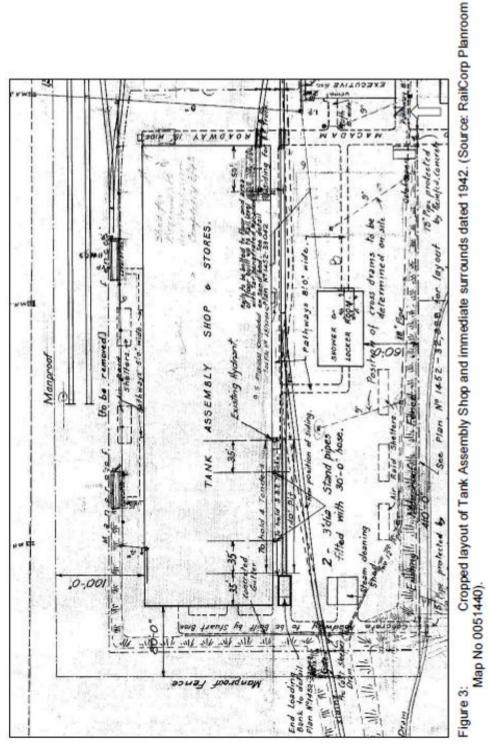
Plan from 1942, useful in identifying the original portion of the building
